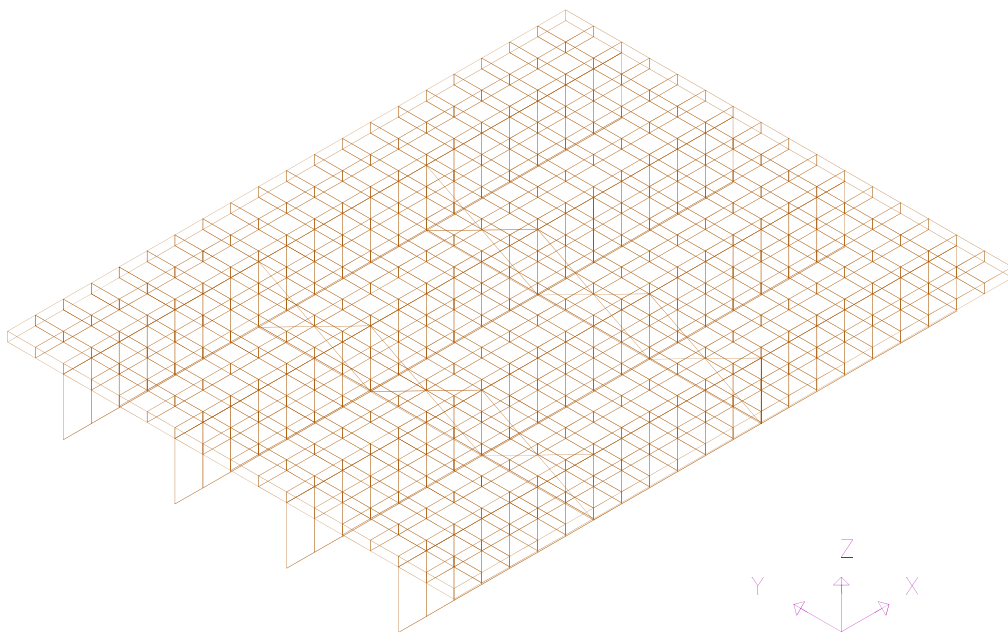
Typical finite element mesh for slab-on-girder highway bridge.
